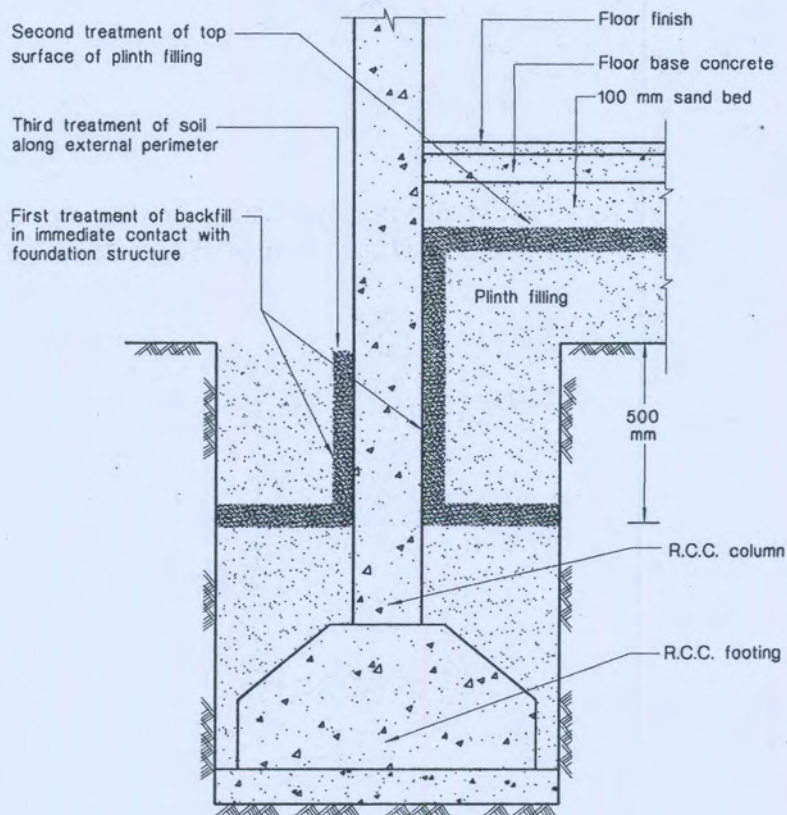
Treatment for R.C. Framed Structure with Columns and Plinth Beams (Suggestive Typical)
